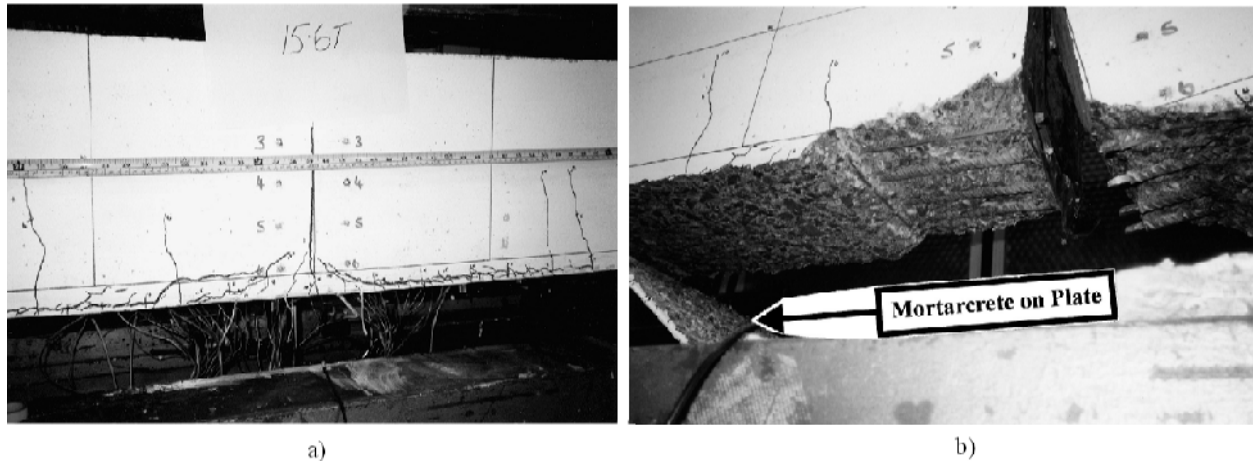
Debonding failure: (a) Inclined cracks and concrete fracture near midspan before failure; (b) Soffit of beam at midspan after failure; (Sebastian, 2001).
